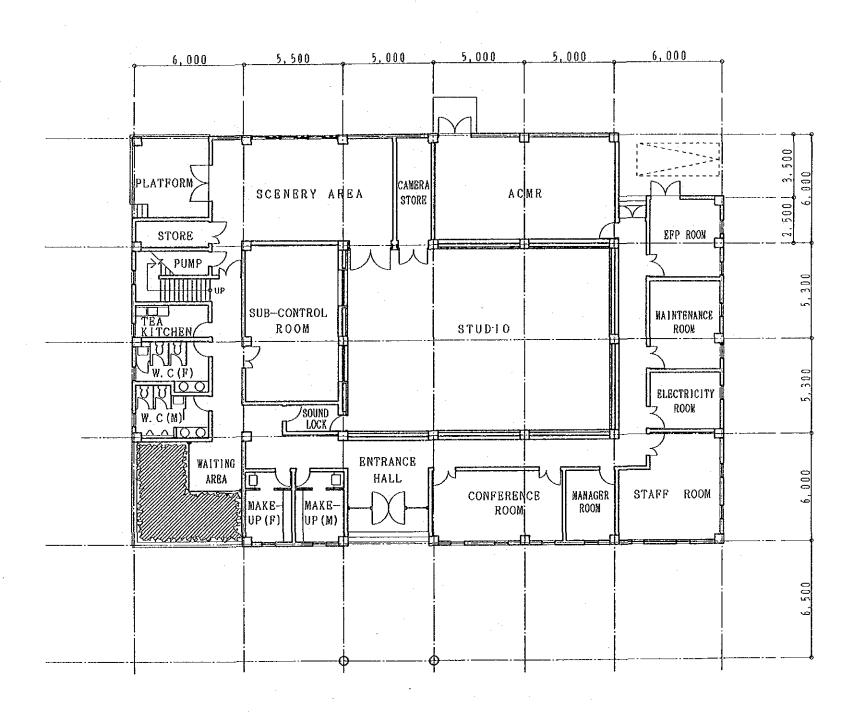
GROUND FLOOR PLAN, SCALE 1:200
